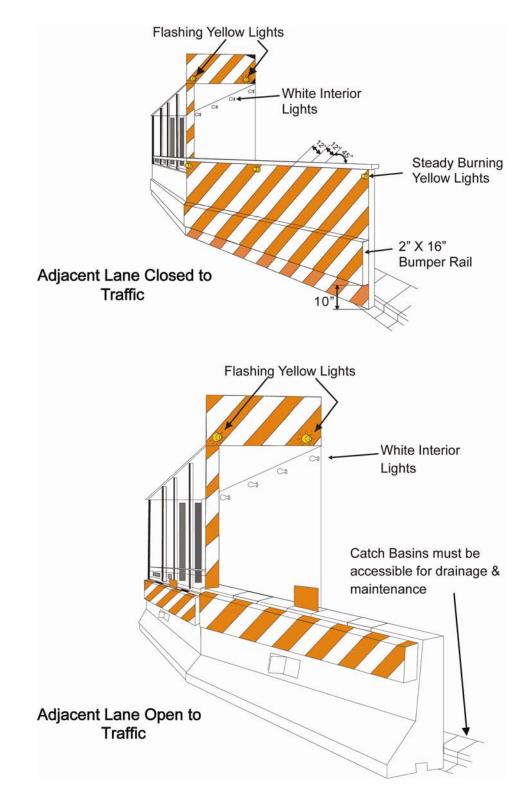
Typical Application: Covered Pedestrian Walkways – Midblock Locations
